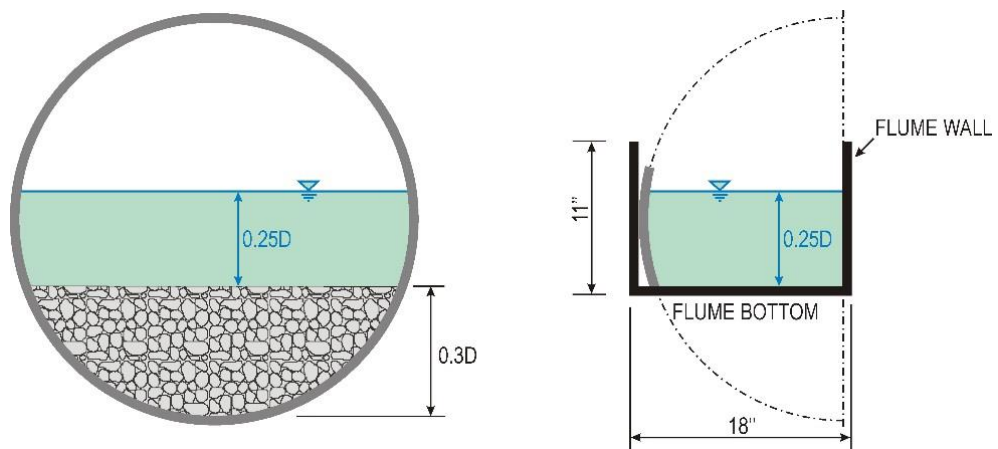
Bed Elevation at 0% Culvert Diameter and Symmetrical half of the Model
